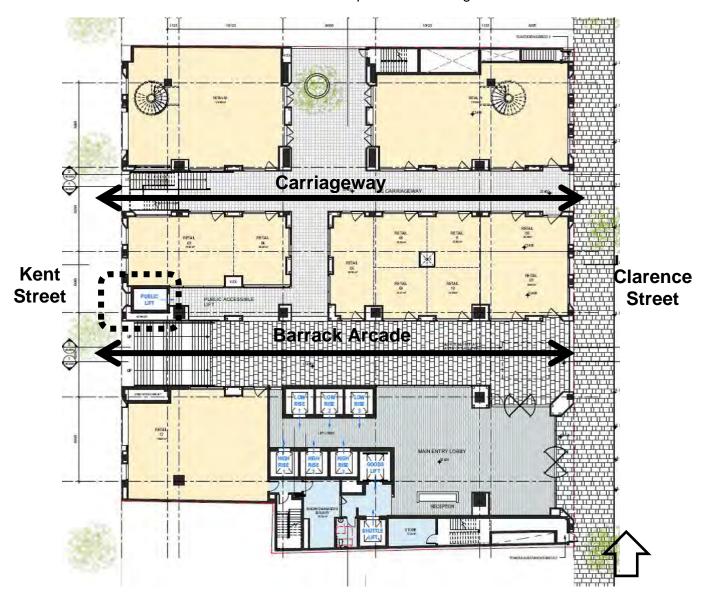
Proposed location of the through site links between Clarence Street and Kent Street and public lift (dashed).
